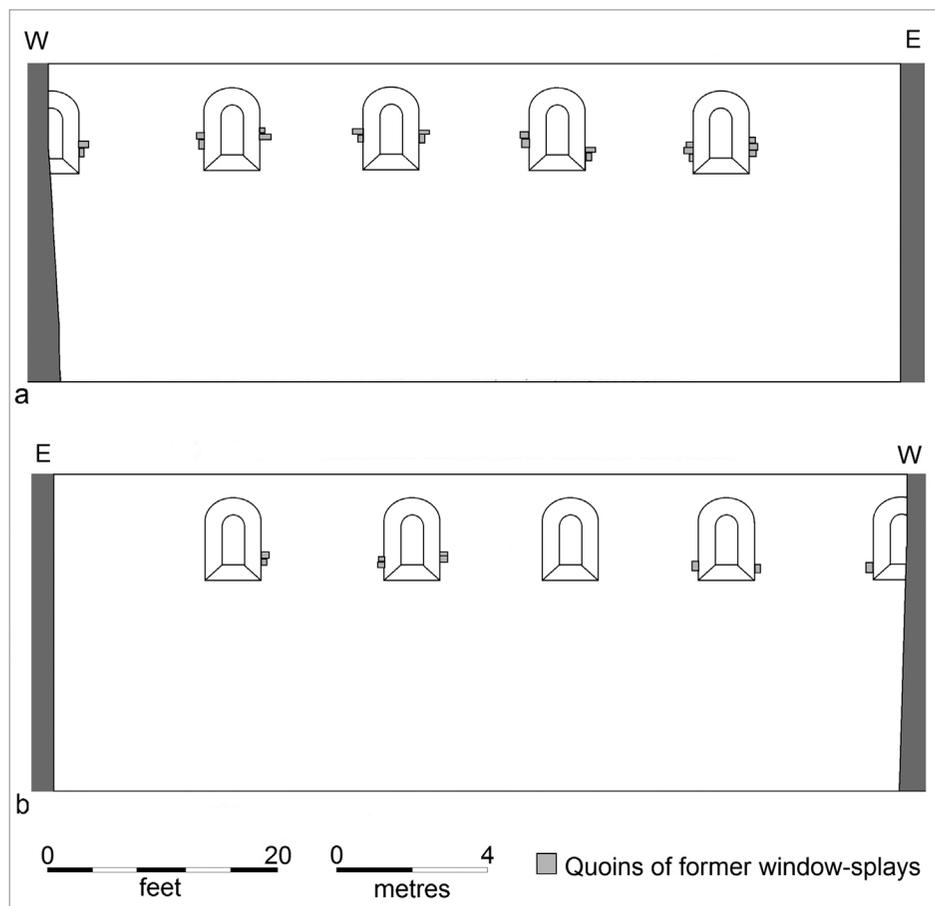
Reconstructed (a) north and (b) south elevations of Lanfranc's nave. NB: levels of reconstructed windows and wall-head are conjectural (scale 1:200)
